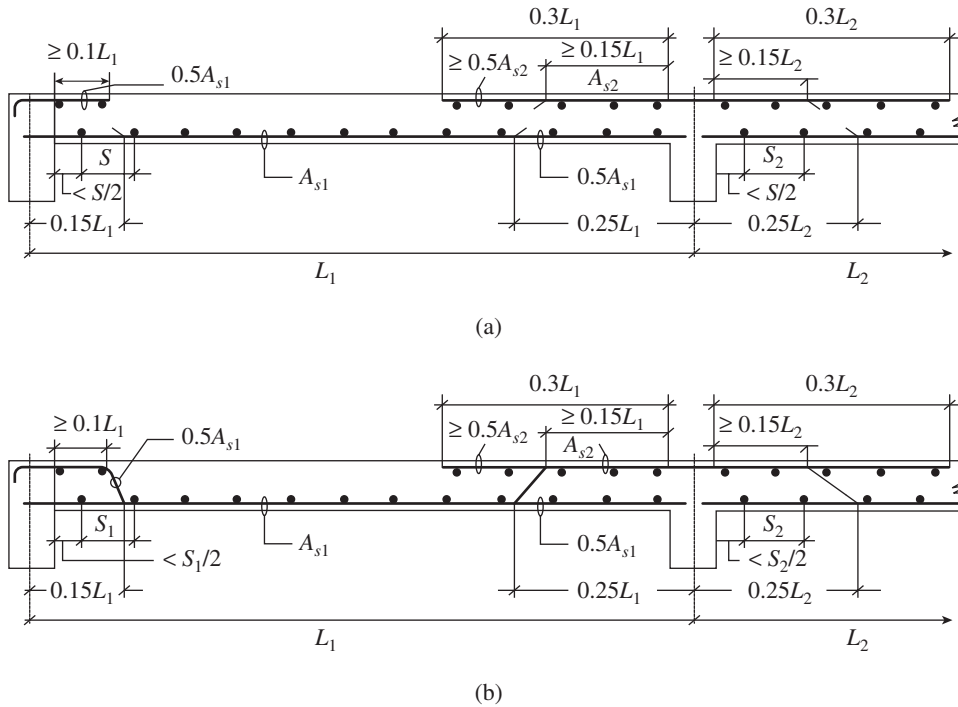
Detailing of continuous one-way slab as per SP 34-1987 (a) Using straight bars (b) Using bent-up bars
